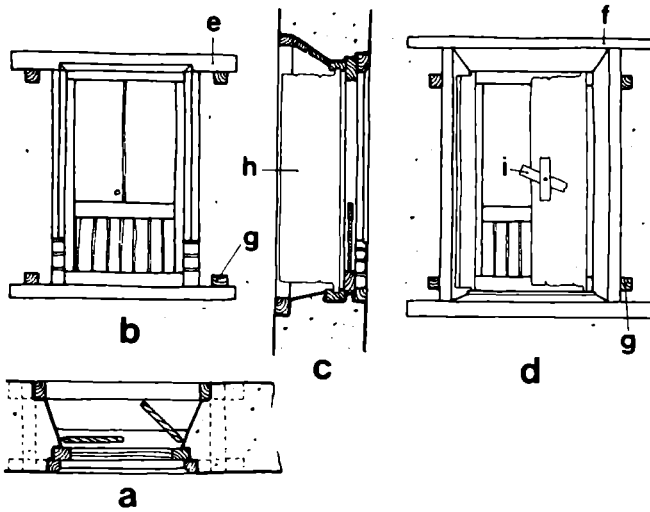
Detail of a traditional window — a : horizontal section; b : external face; c : vertical section; d : internal face; e : external frame; f : internal frame; g : brace; h : leaf; i : latch.
